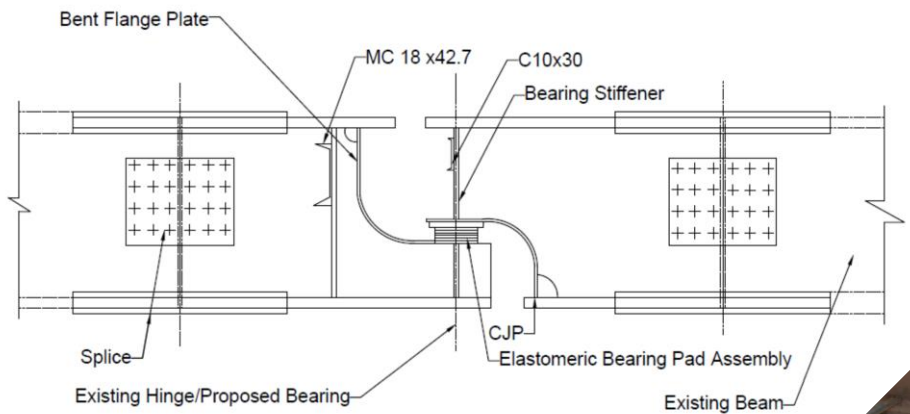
Ship lap joint detail (Mass DOT, 2014)
